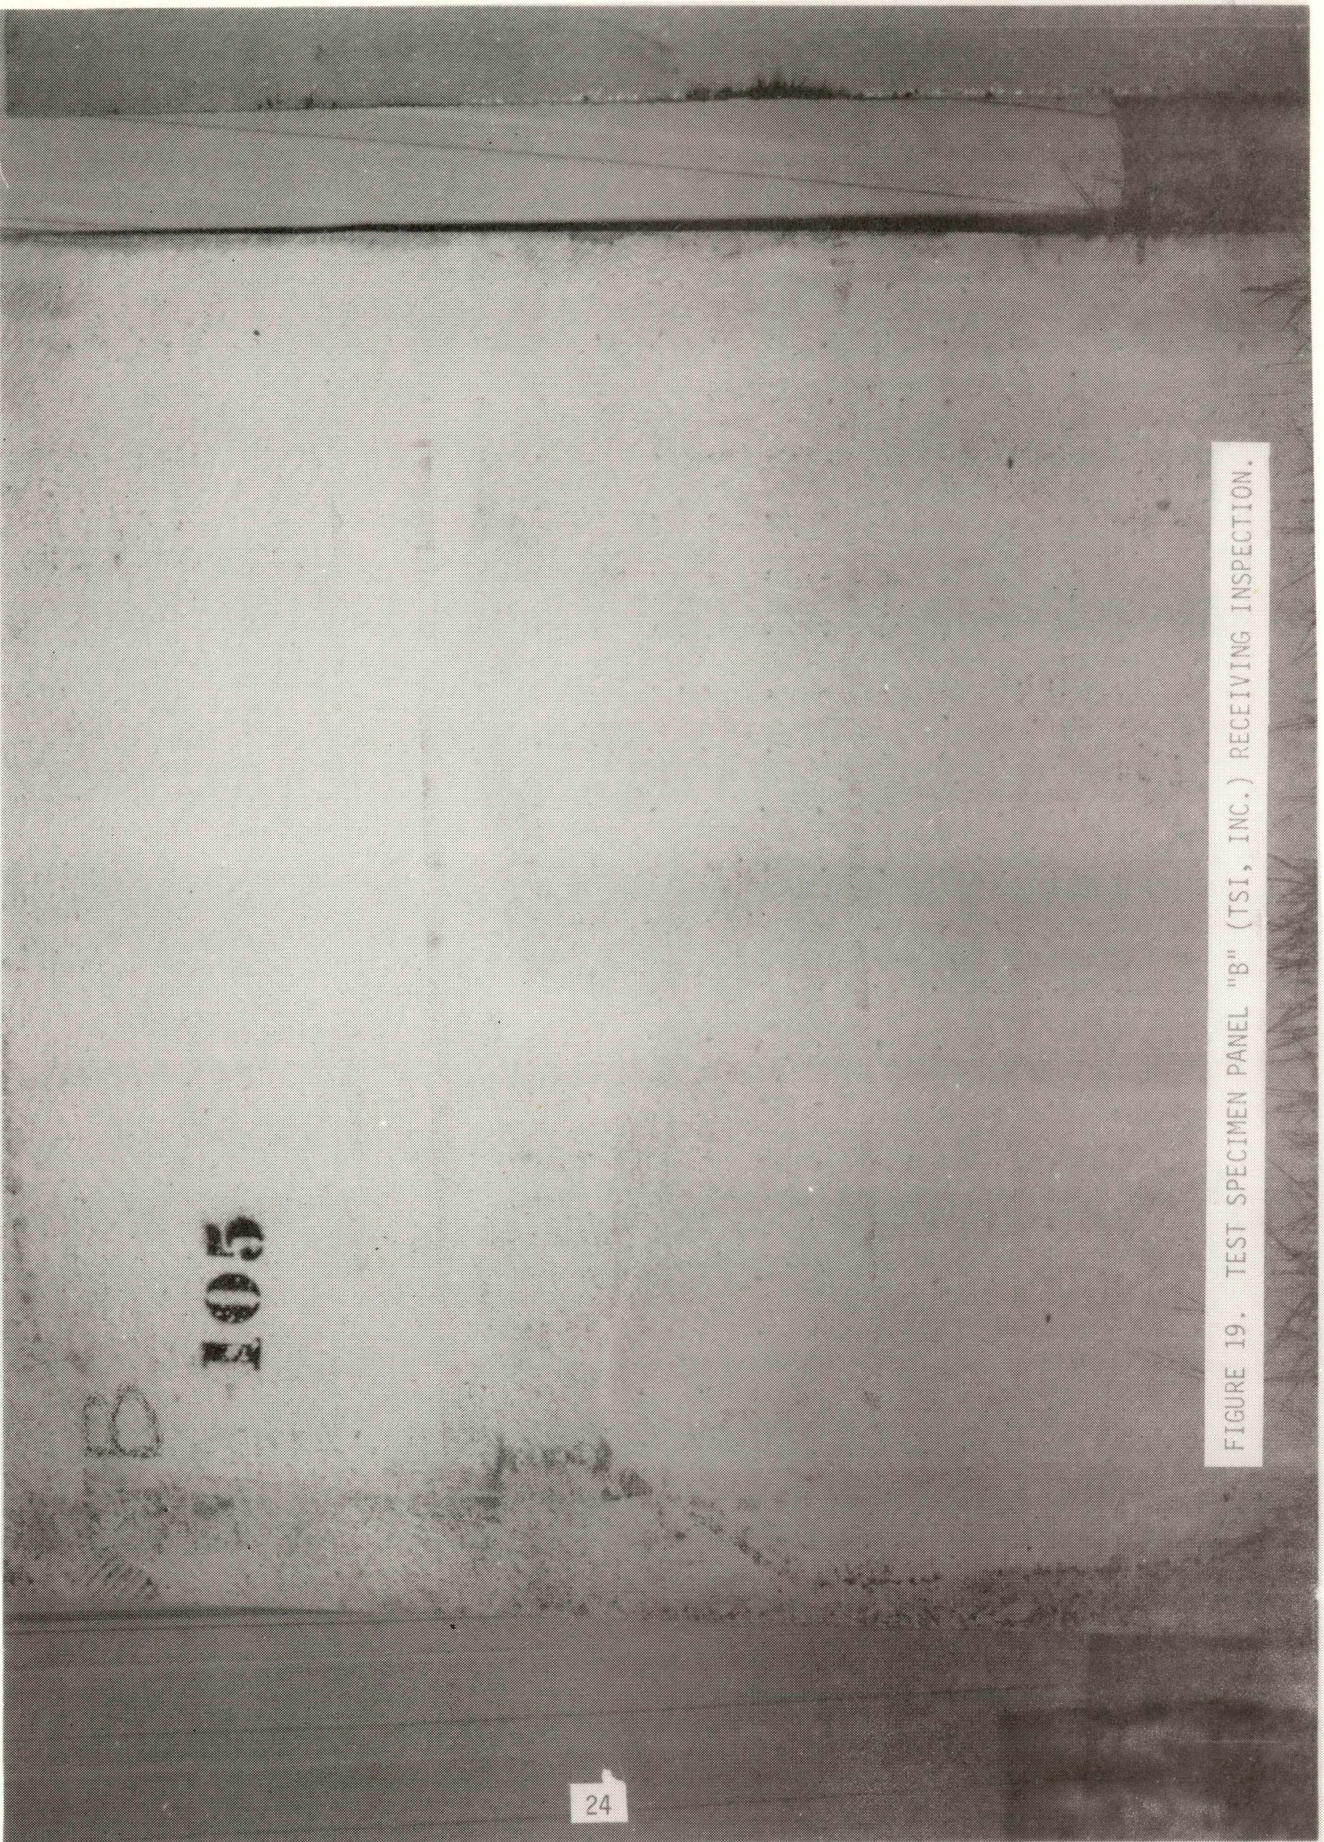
TEST SPECIMEN PANEL "B" (TSI, INC.) RECEIVING INSPECTION.
